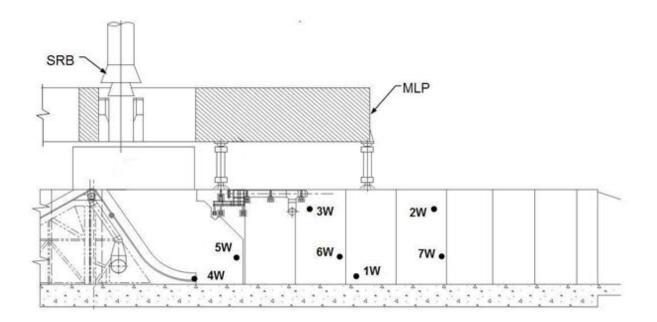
Sensor Locations on the West Wall of the SRB Flame Trench
